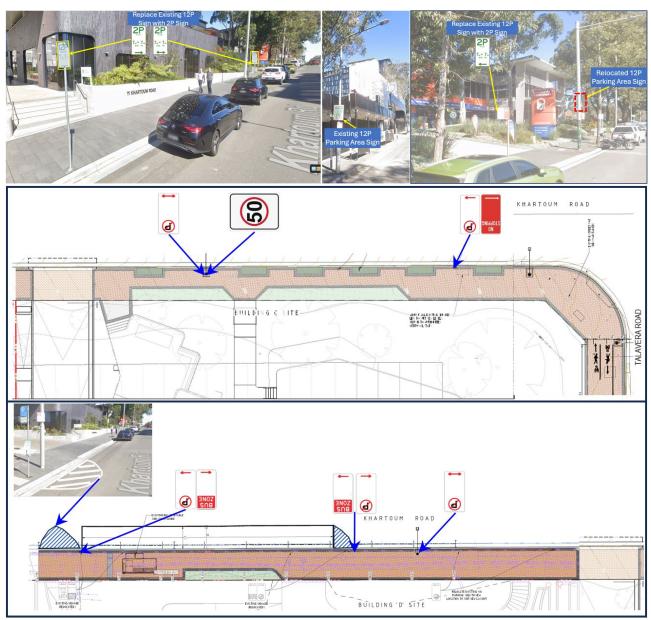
Proposed signage and linemarking along site frontage with Khartoum Road
